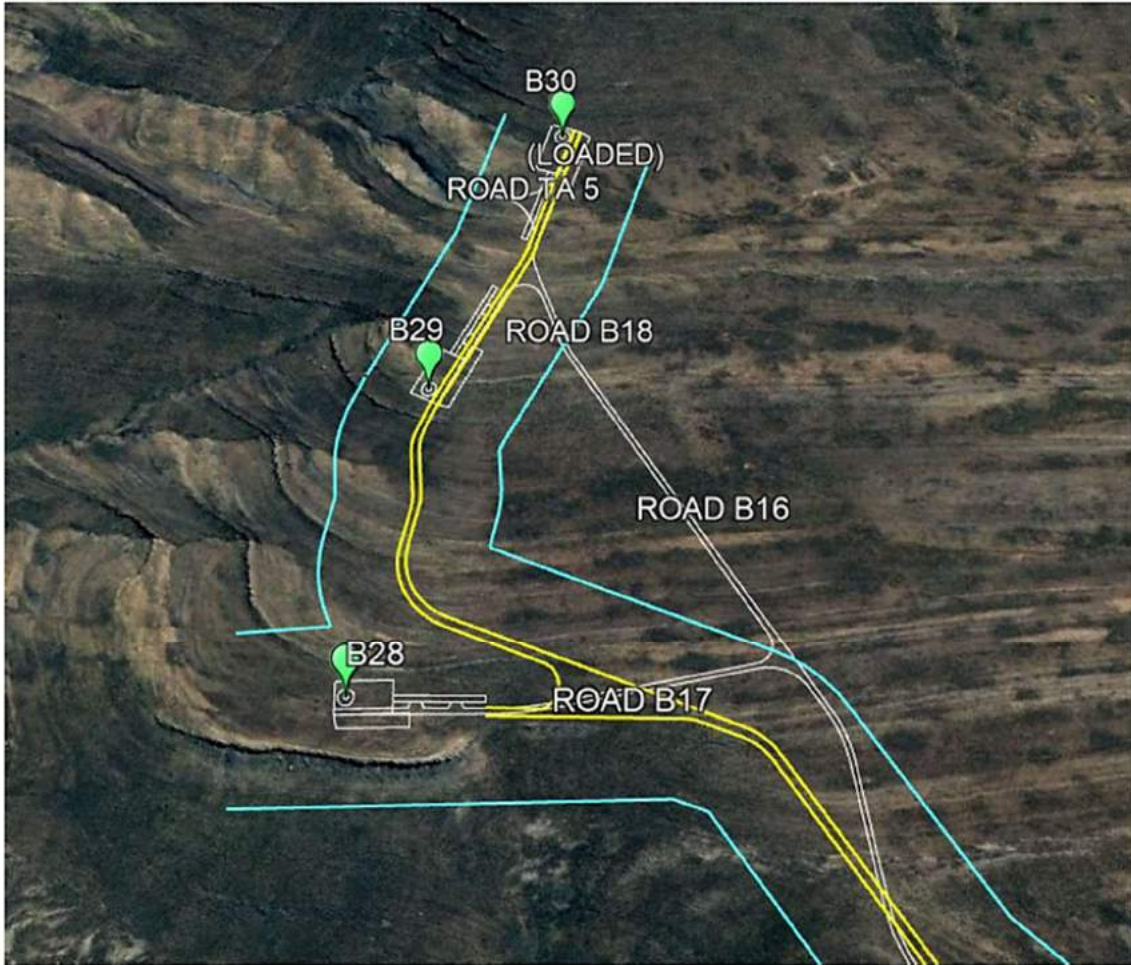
4: Plan showing horizontal re-alignment of Road B16 (Yellow – approved layout, White - proposed deviation blue the approved 200m road corridor DEA reference 14/12/16/3/3/2/900–dated 23 November 2016). Note new alignment (white) follows contour of mountain.
